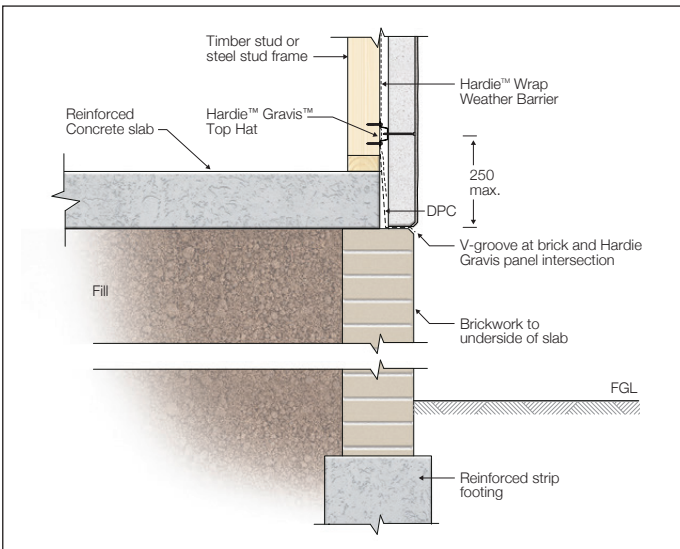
JUNCTION TO MASONRY EARTH RETAINING WALL
